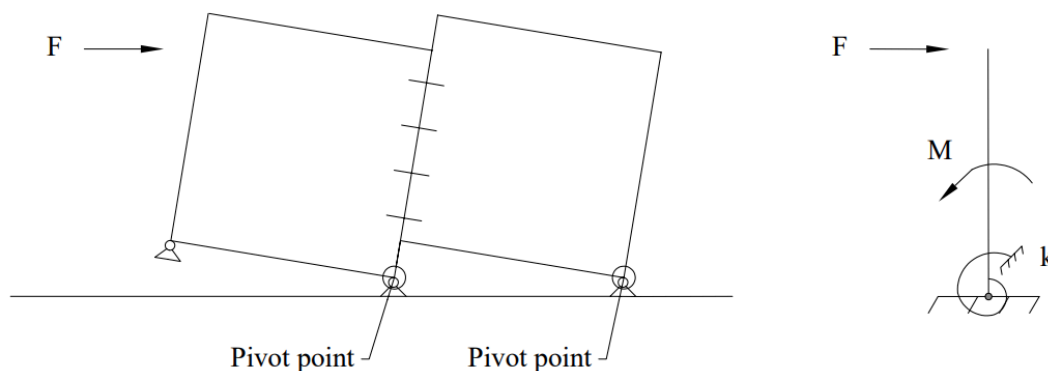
Simplified frame model: Coupled wall represented by a cantilevered beam.
